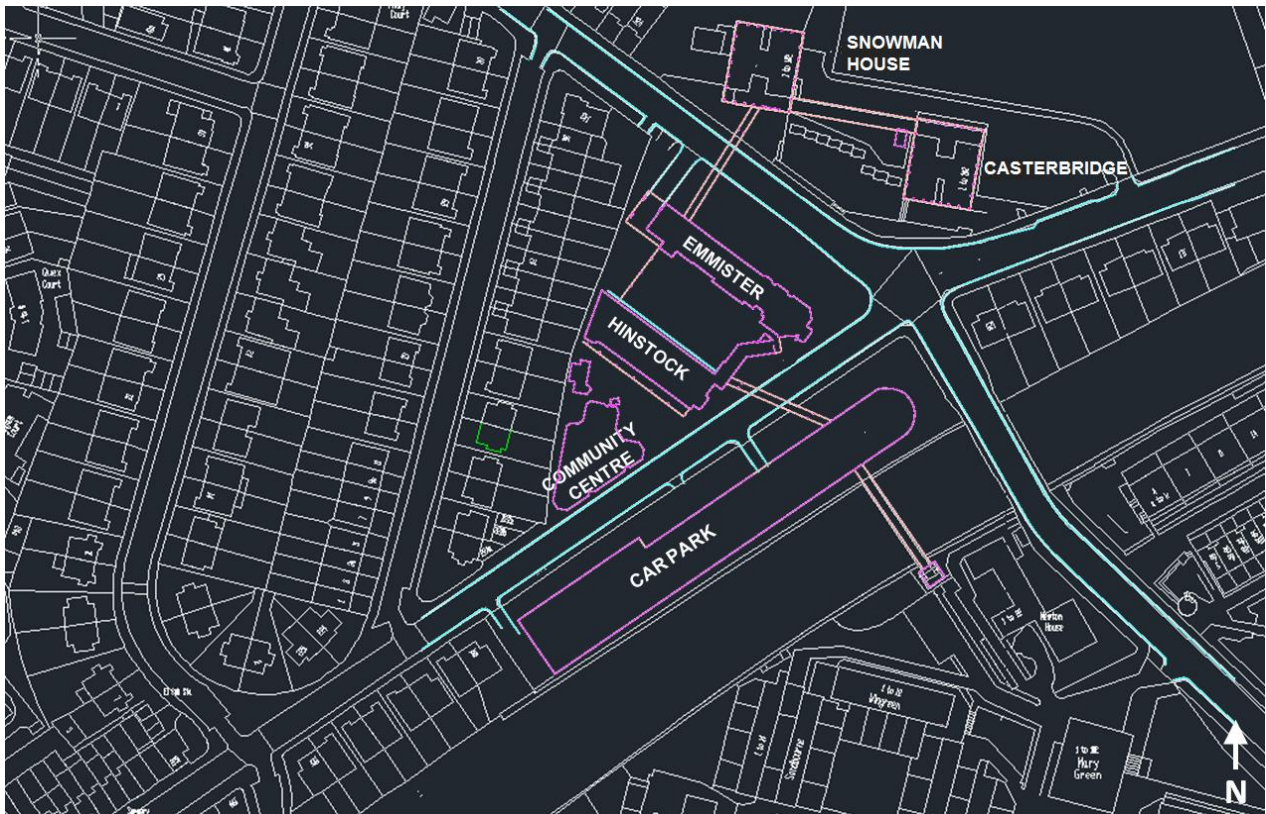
Abbey road regeneration site, existing buildings to be removed shown in purple.
